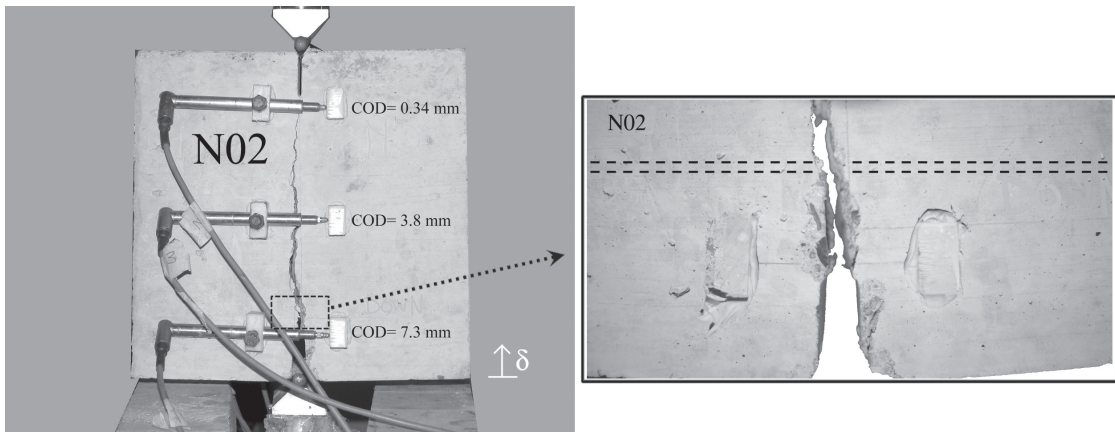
(a) Concrete plates N02, (b) breaking of the steel bar
